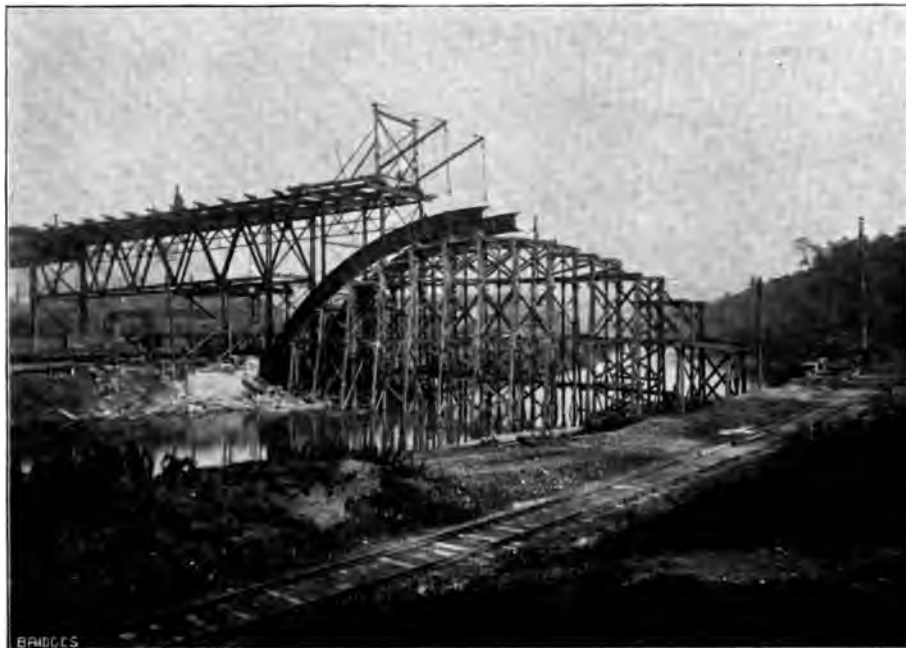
MARKET STREET PLATE GIRDER ARCH.
